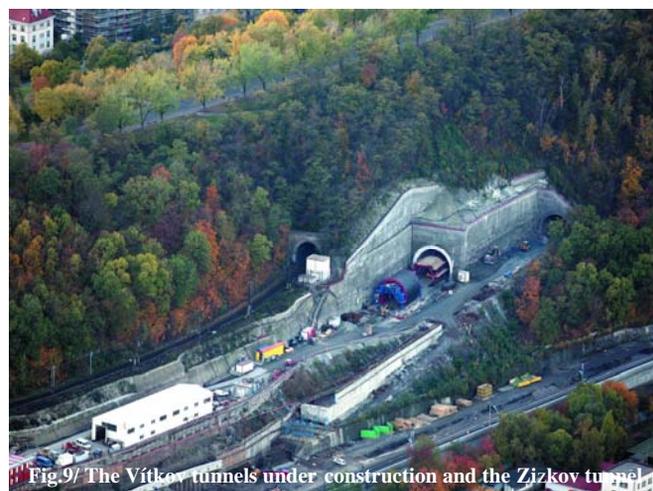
/ The Vítkov tunnels under construction and the Zizkov tunnel
